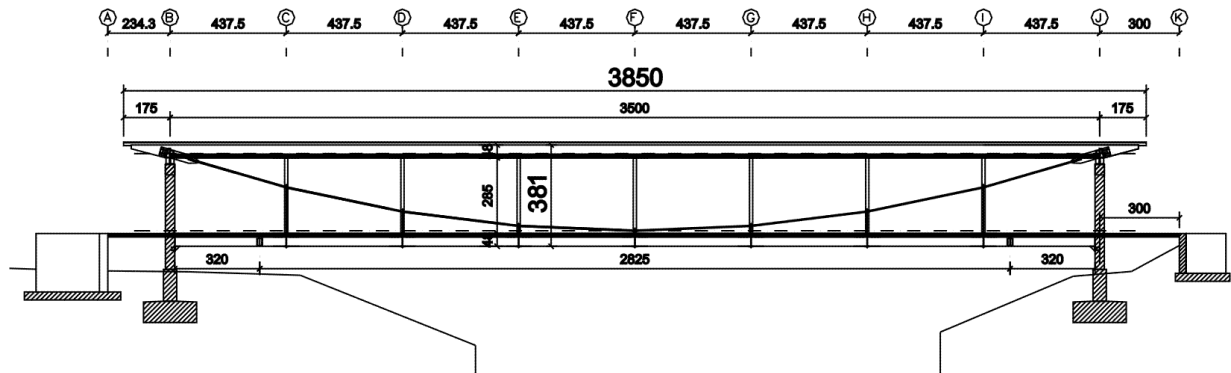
Longitudinal section and structural system of pedestrian bridge „Raabsteg“ in Feldbach (A)
